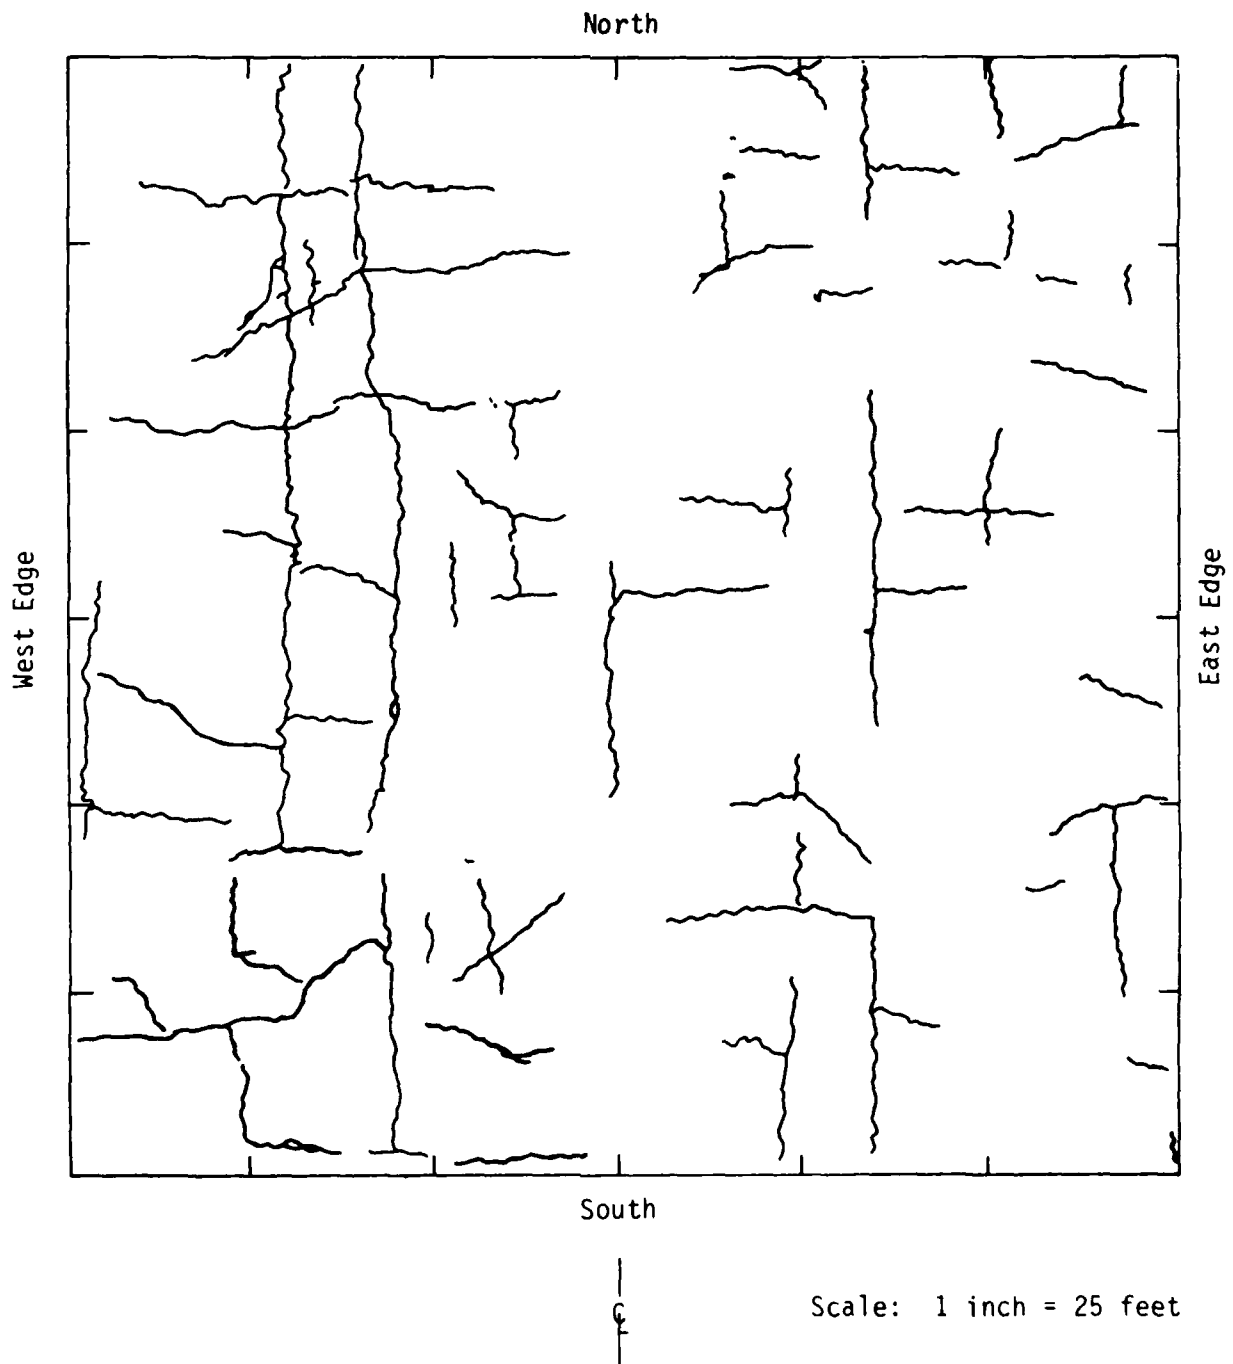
Existing Cracking at Coolidge Airport, November 2, 1984.
